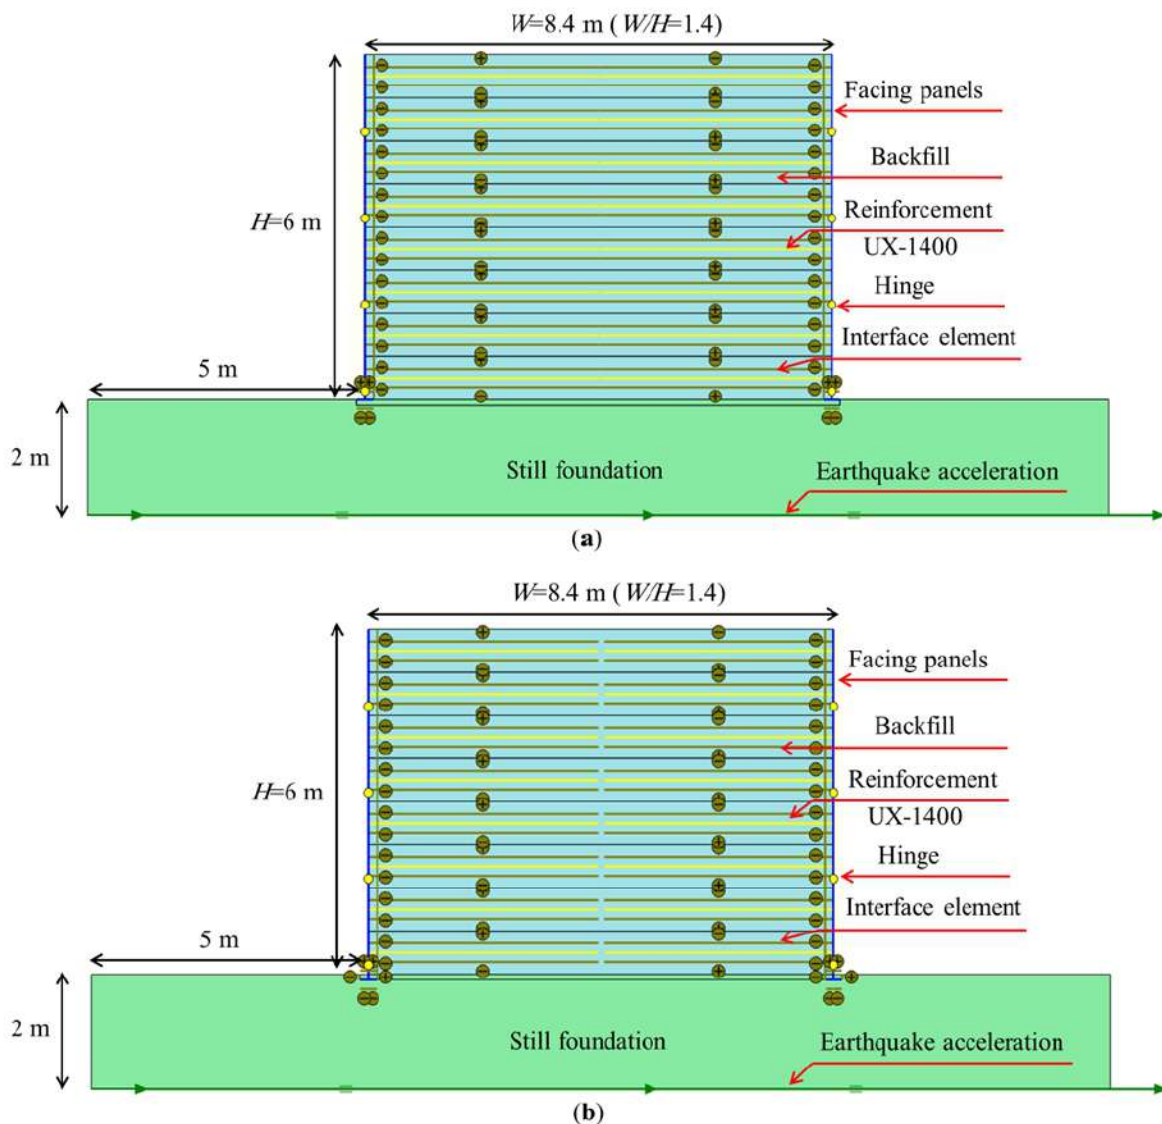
Finite element models of back-to-back MSE walls: (a) connected case; and (b) unconnected case.
